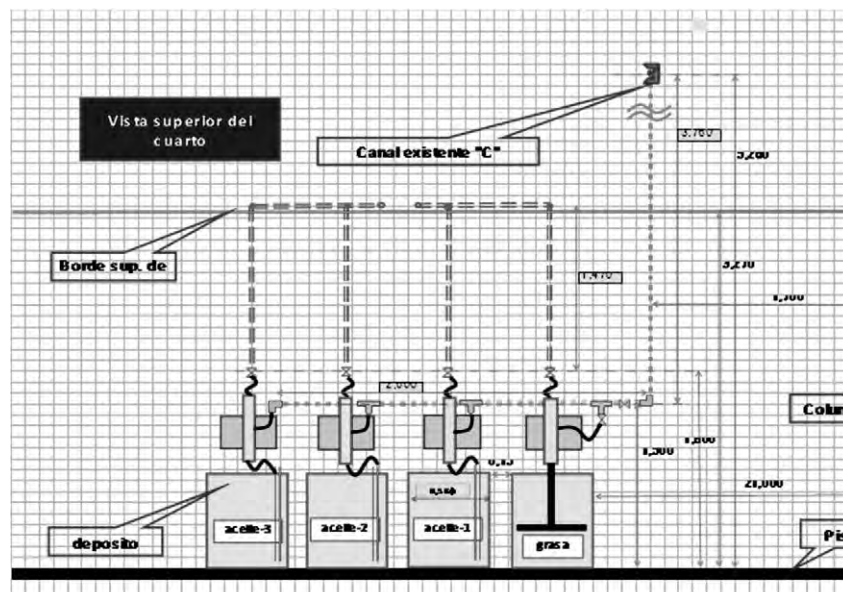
Piping Layout (Inside the Room) (Unit: mm)
